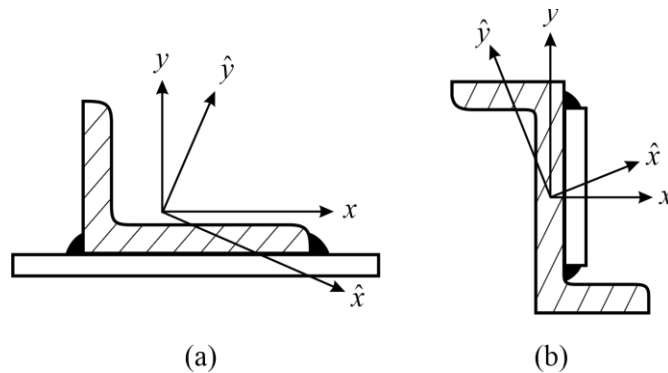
\* Typical end connections for members with (a) angle cross-section (b) zed cross-section
